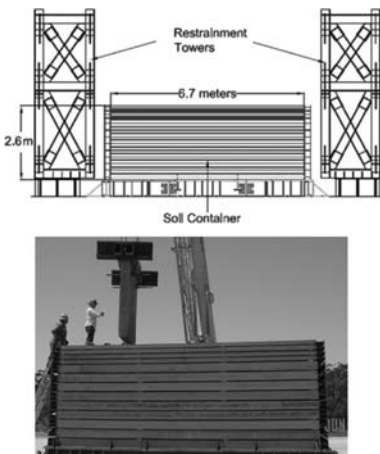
Schematic elevation view of soil container and restraining towers, and insertion of test wall into container (Wilson 2009).
